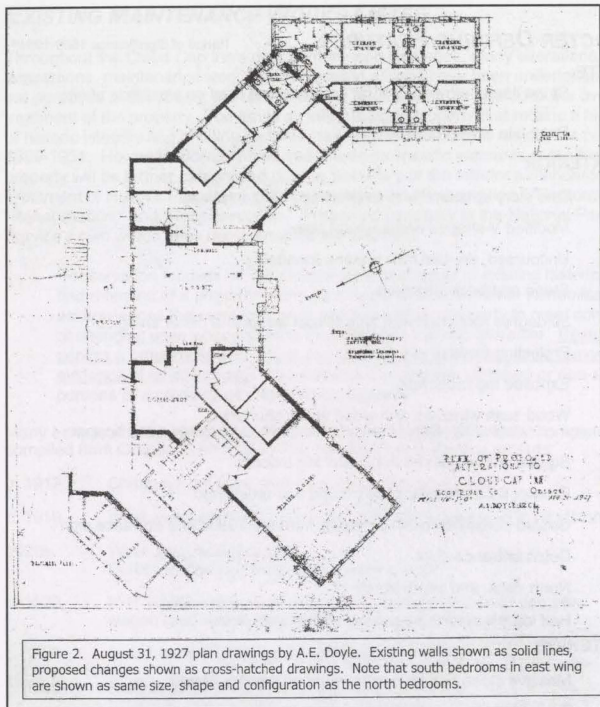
August 31, 1927 plan drawings by A.E. Doyle. Existing walls shown as solid lines, proposed changes shown as cross-hatched drawings. Note that south bedrooms in east wing are shown as same size, shape and configuration as the north bedrooms.
